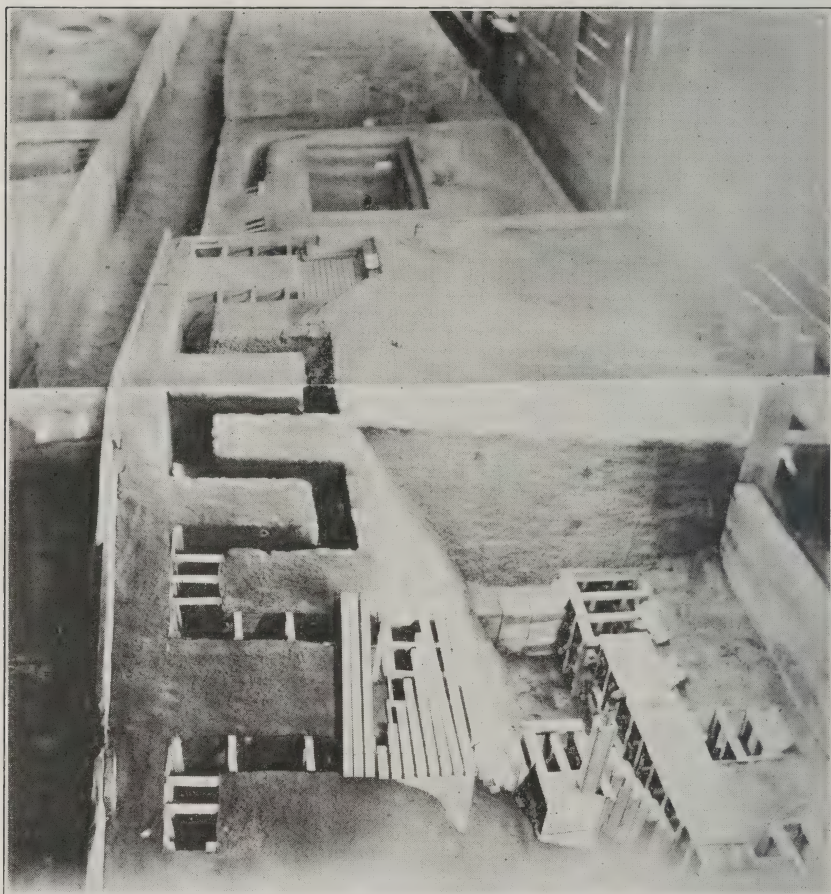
Cave Shelter (foreground section left open for illustration of construction). Shows details of construction and protection of entrances. (See plate following p. 32, "Notes on Construction of Deep Gallery Shelters," W. D. Doc. 691.)
